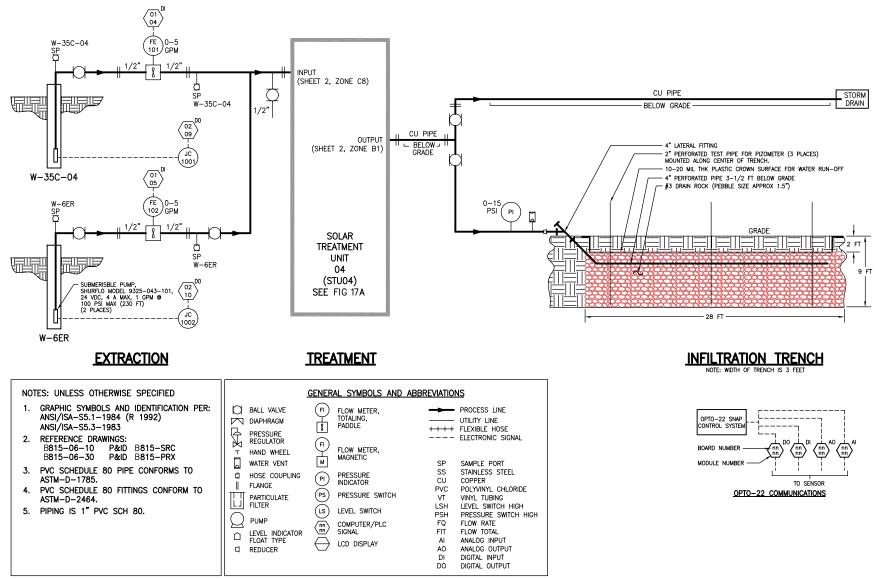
B. Piping and instrument diagram for B815-DSB (infiltration trench).
